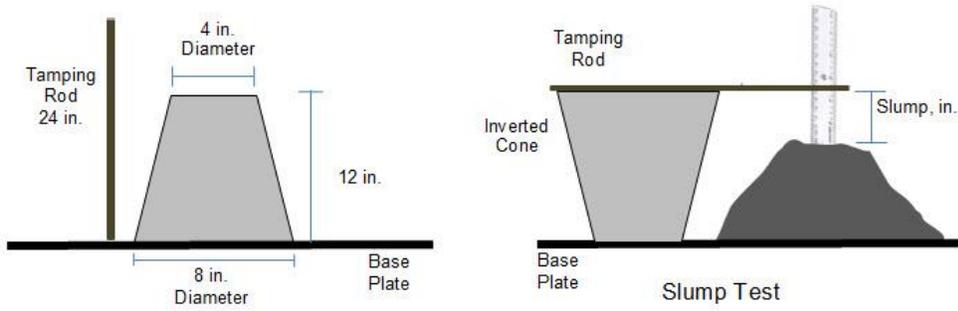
Slump test scheme (drawing courtesy of Adel Alsaffar)
